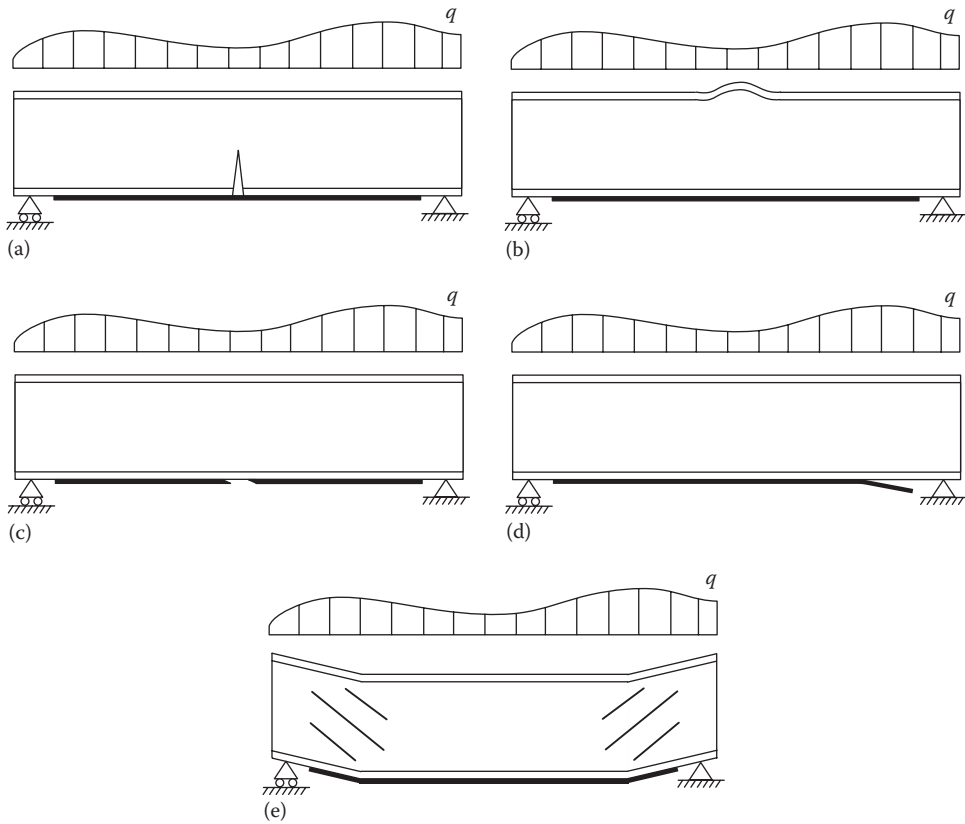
Failure modes of a metallic beam strengthened with FRP and loaded in flexure. (a) Tension failure of substrate, (b) local buckling of strengthened member, (c) tension failure of strengthening, (d) debonding, and (e) shear failure.
